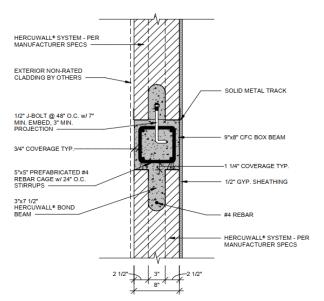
Typical HercuWall® CFC Box Beam Wall Construction Concrete Option
